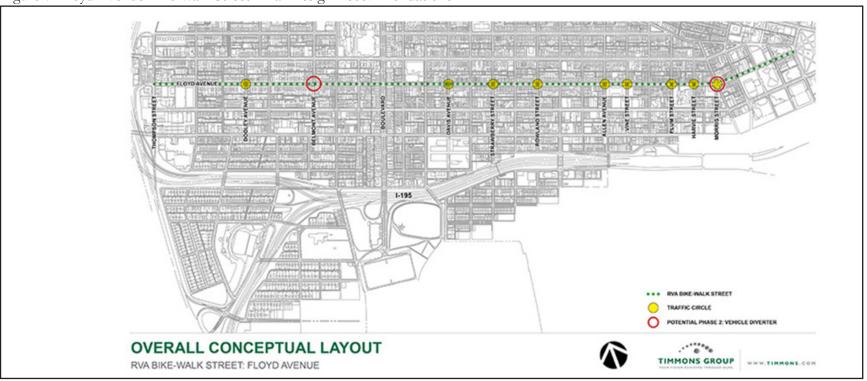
Floyd Avenue Bike/Walk Street Original Design 19
